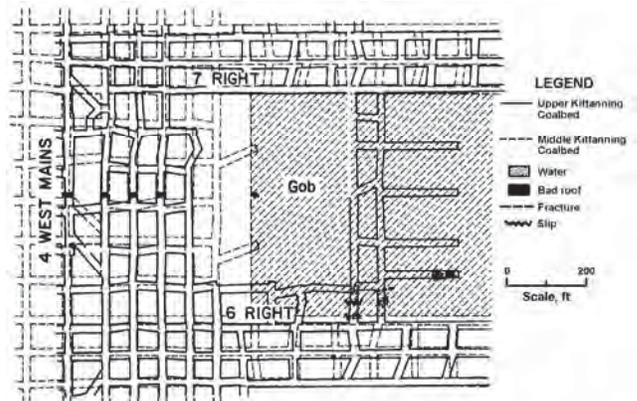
Stacked gate road layout at Bethlehem Mines Corp.'s No. 33 Mine [Bauer et al. 1992].
